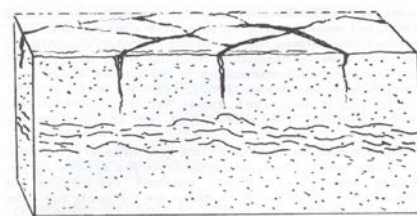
Sketch showing typical features of surface map-cracking and sub-parallel cracks in concrete with ASR. Stresses due to ASR grades from horizontal tension near the surface to horizontal compression and vertical tensions with depth
